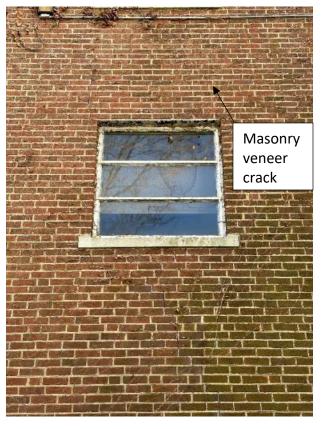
Overall view of left (North) elevation. No control joints observed. Cut in masonry control joints.
